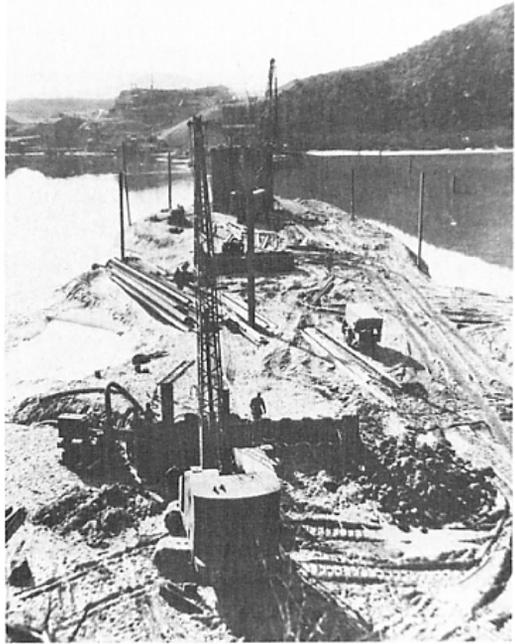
Cofferdam 3 filled with 240 cubic yards of concrete constituting the initial or A pour. Water is being used to cure the concrete, and the scaffold floor at right is ready to be set in place.
